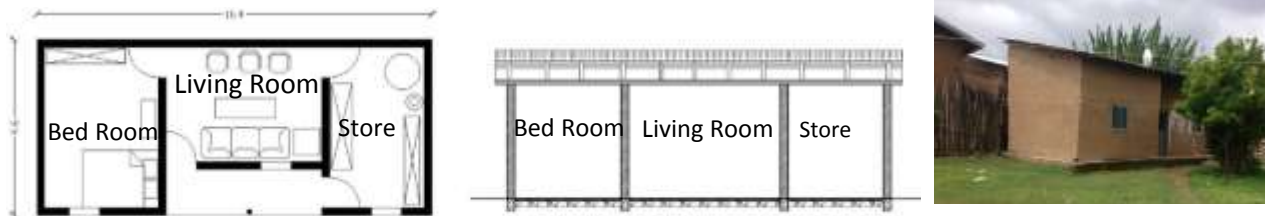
W/ro Degnesh's son service building plan, section and pic
